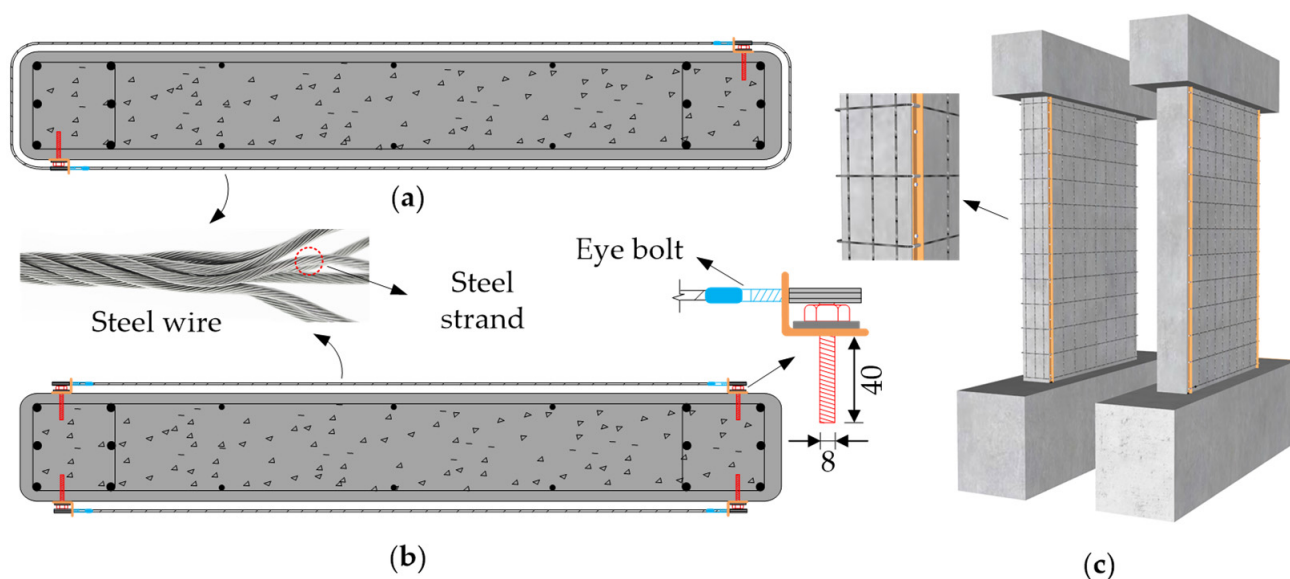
Adopted steel wire mesh strengthening method: (a) wrapping around surface; (b) wrapping only on exposed surfaces; (c) elevation.
